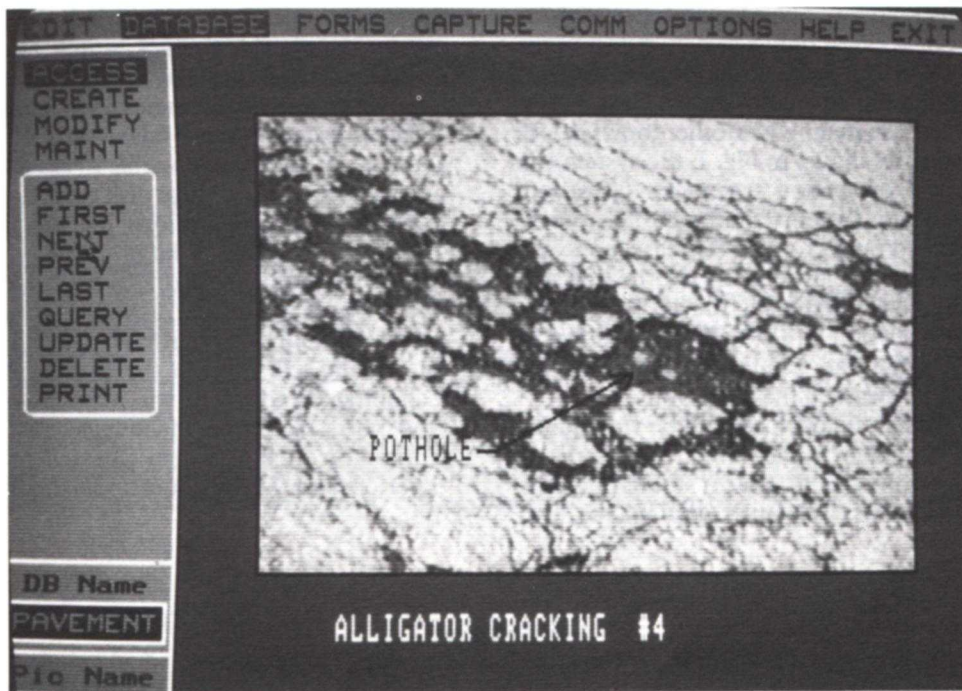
Video still-frame placed in the IDB showing alligator cracking.
